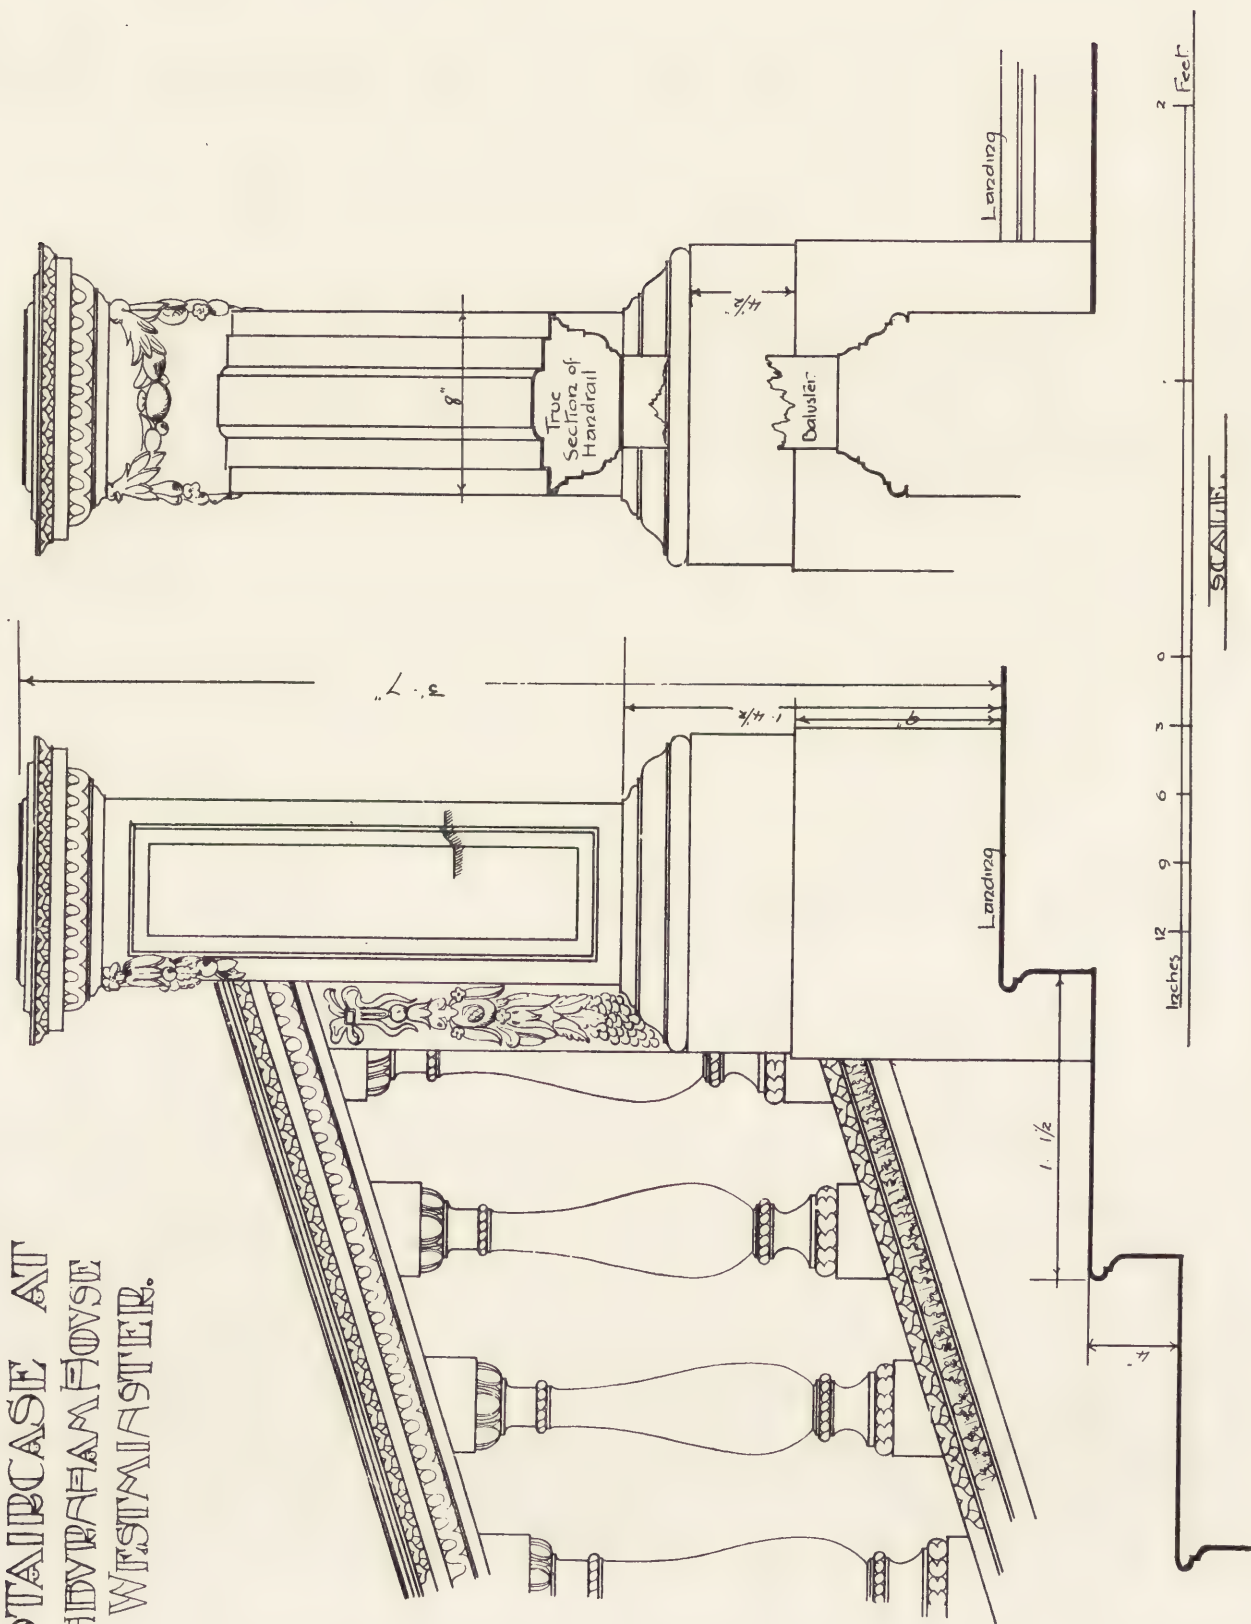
DETAIL OF STAIRCASE, ASHBURNHAM HOUSE, WESTMINSTER.
